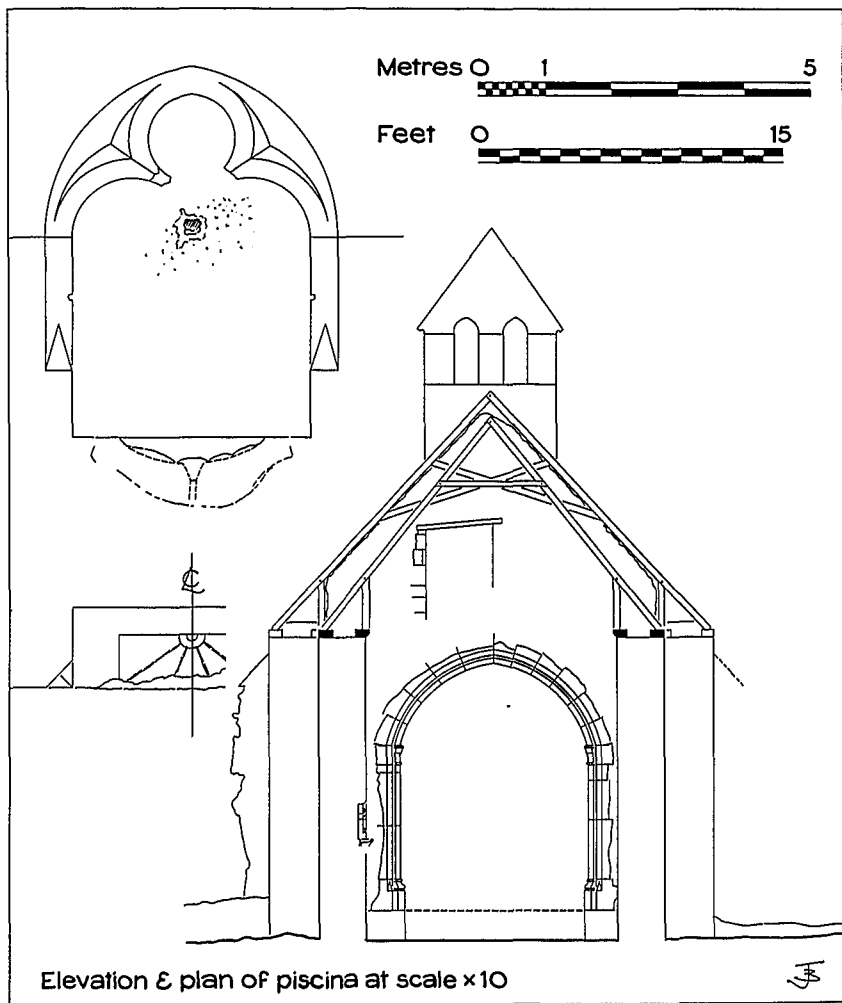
Horton Manor Chapel: Chancel, looking West with Elevation and Plan of Piscina.
